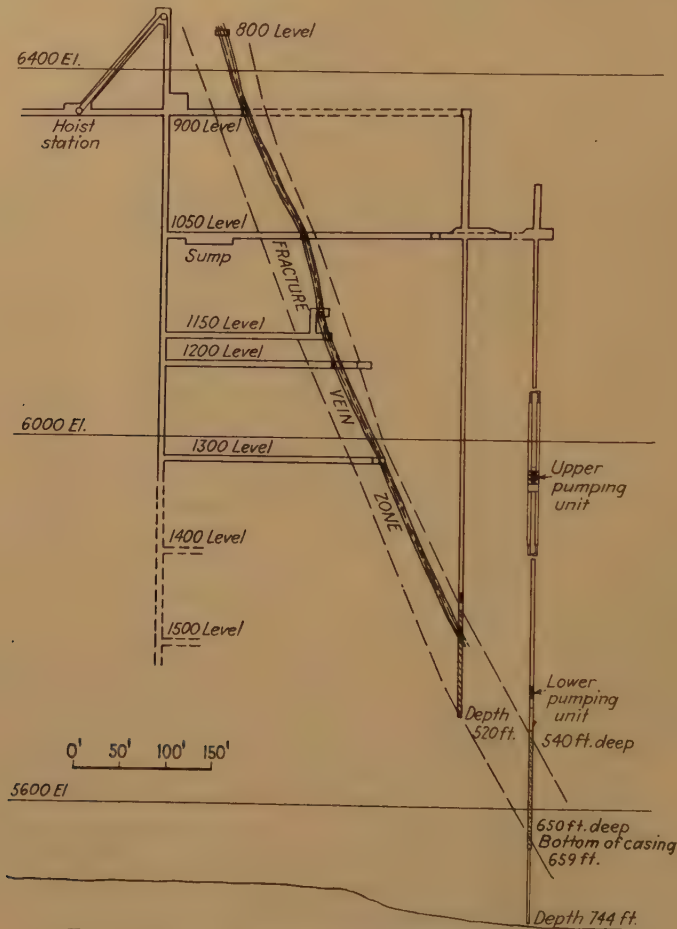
VERTICAL SECTION SHOWING DRAINAGE DIAGRAM.
